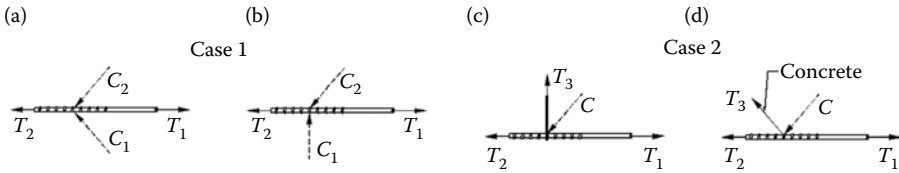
Typical examples of reinforcement anchorage by bond. Anchor forces are supported by: (a, b) two concrete compression struts, (c) one concrete compression strut and one steel tie, and (d) one concrete compression strut and one concrete tie. (From Schlaich, J., and Schäfer K., *IABSE Workshop*, New Delhi, 1993.)
